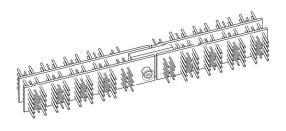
Detail of the coupling joint, steel plates, rod dowels and screws
